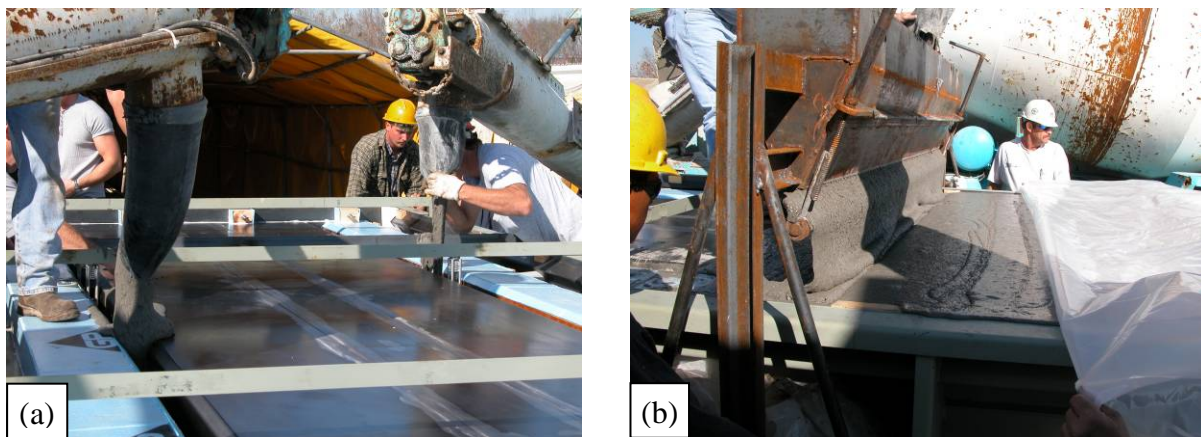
Photo. Concrete placement, including (a) directly into formwork and (b) through trough into formwork.
